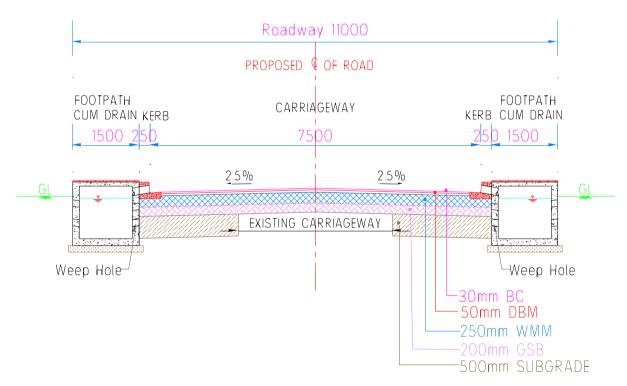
2 — LANE CARRIAGEWAY WITHOUT BREAST AND RETAINING WALL (BUILT UP AREA — MOUNTAINOUS TERRAIN)
